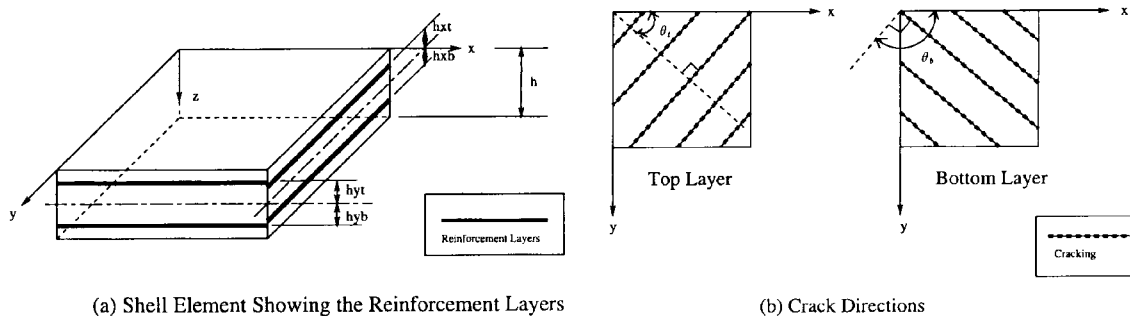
Four reinforcement layers (two for top and two for bottom) and crack directions
